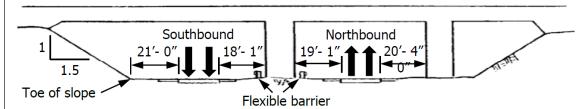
Bridge elevation view of horizontal clearances for separate southbound and northbound highway features below the bridge, with flexible barriers.
